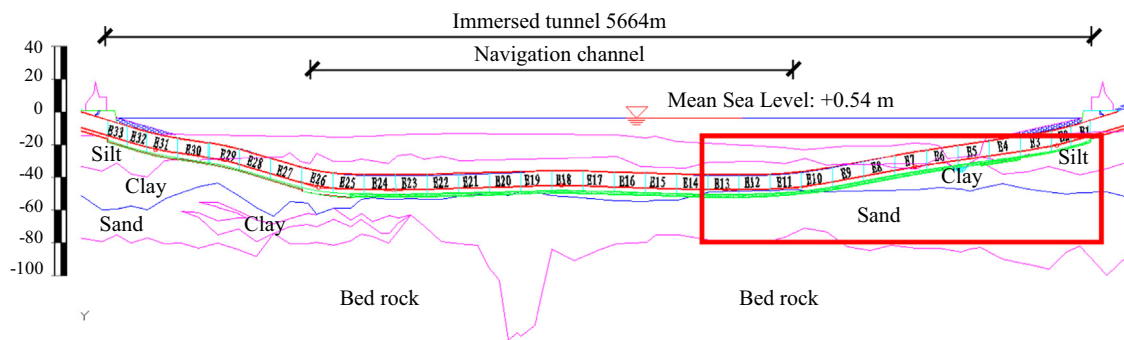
Layout of immersed tunnel and ground layers (unit: m).
